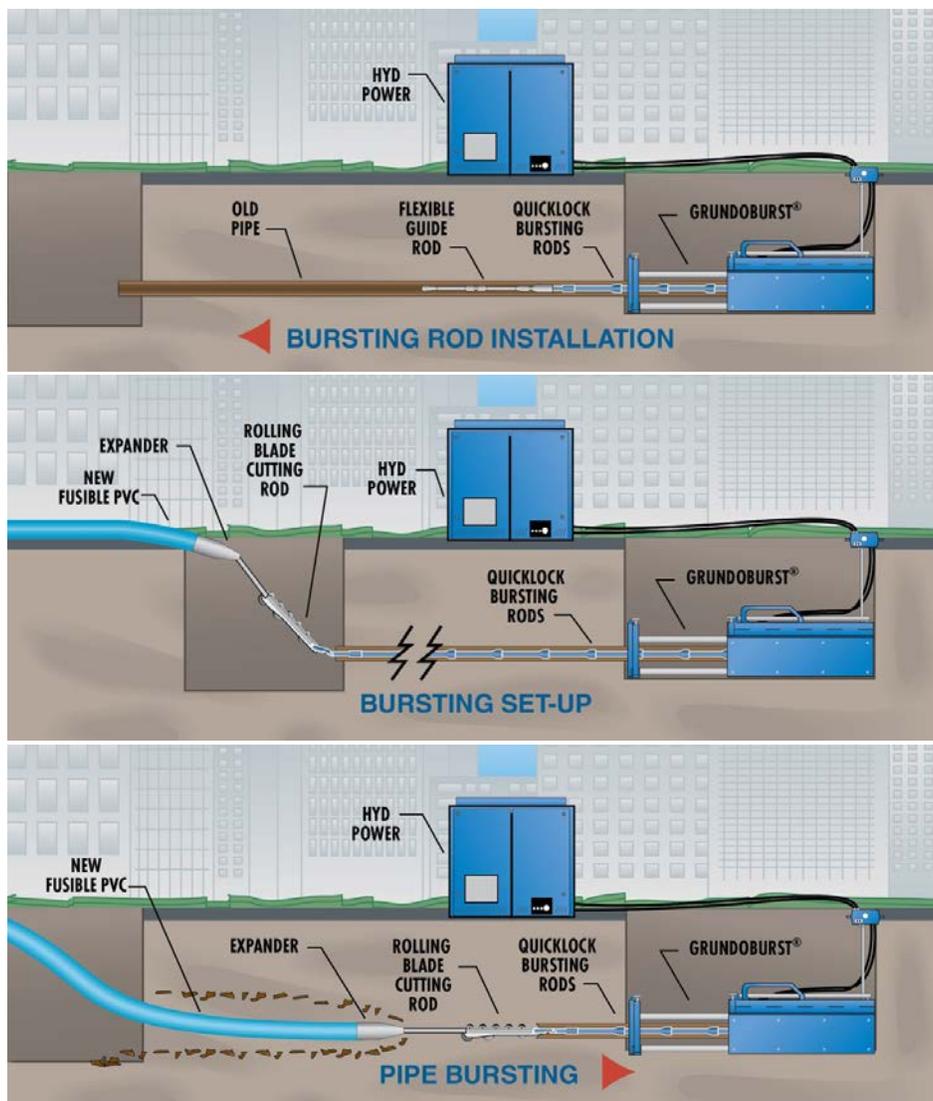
Step-by-step diagram of typical static pipe burst installation.
